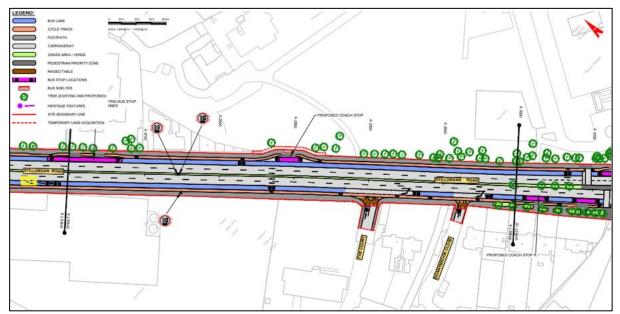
Extract from General Arrangement Drawings at Beaver Row to Nutley Lane (Sheet 09)
